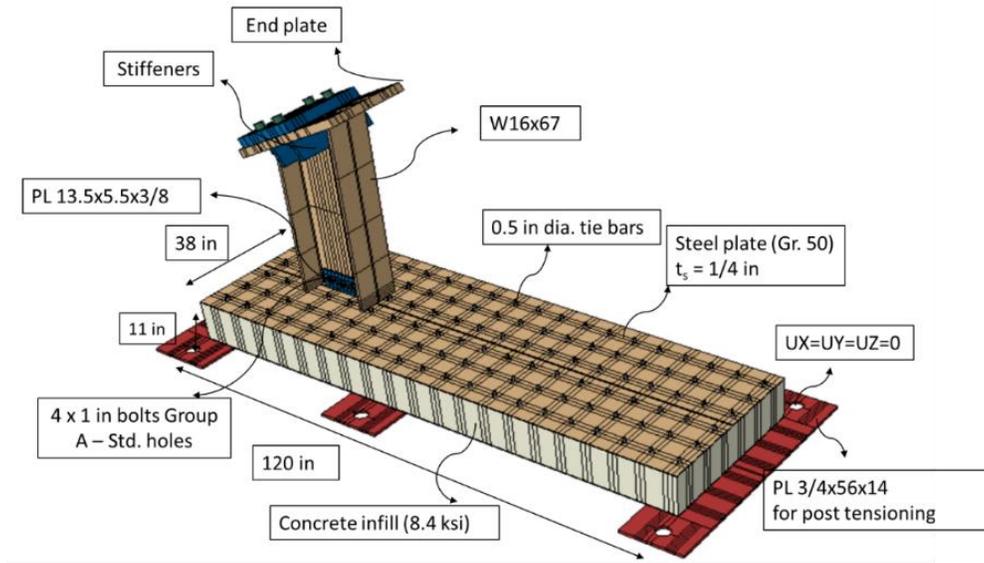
3D model of the floor-to-SpeedCore wall connection
